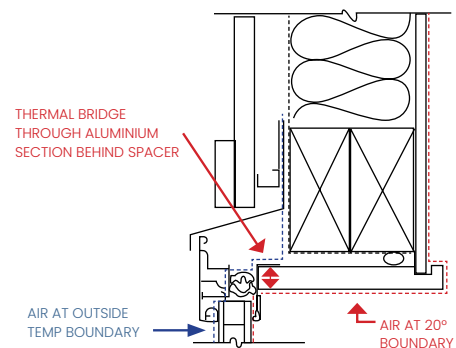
E2 AS1 Aluminium Window Joinery Detail
